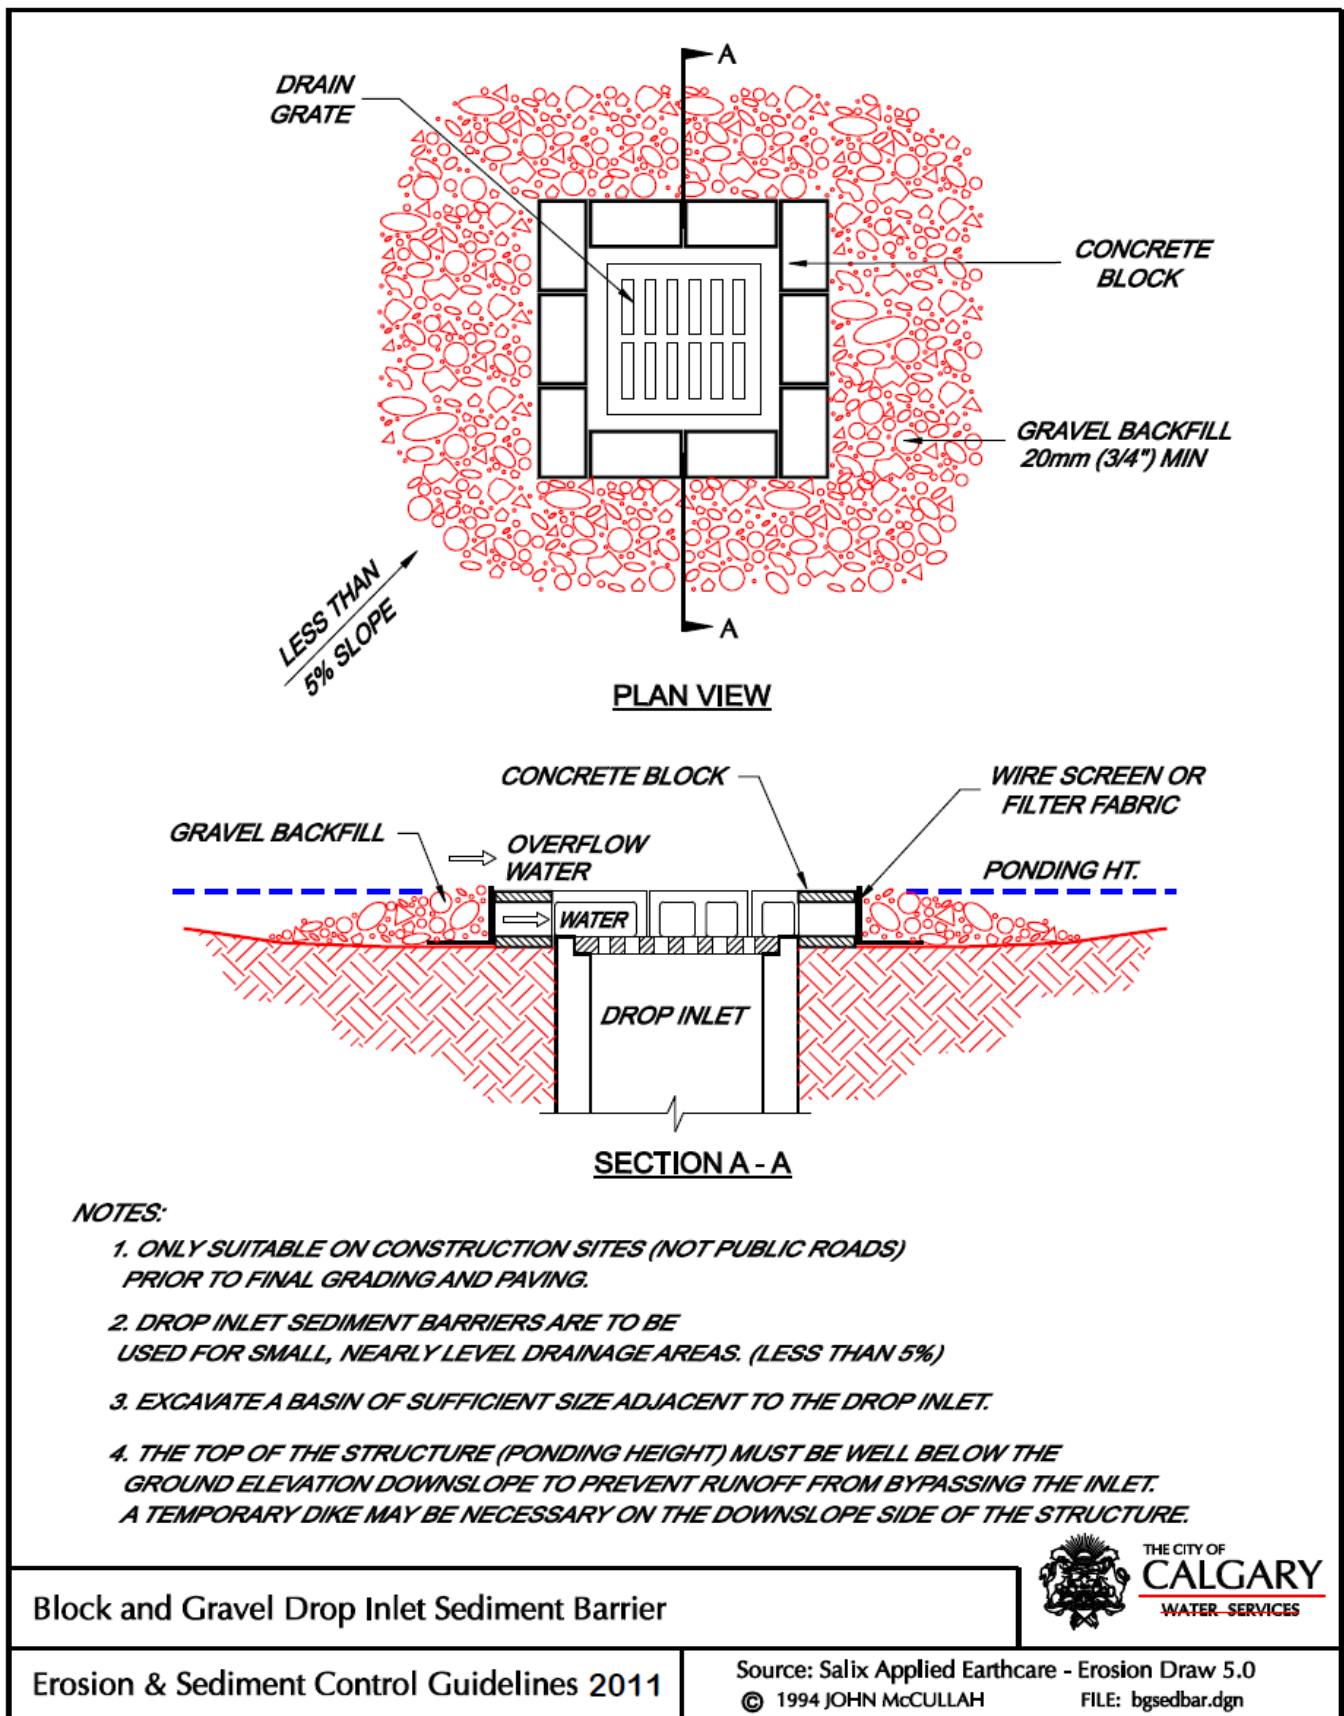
Typical Inlet Sediment Control Detail Prior to Paving
